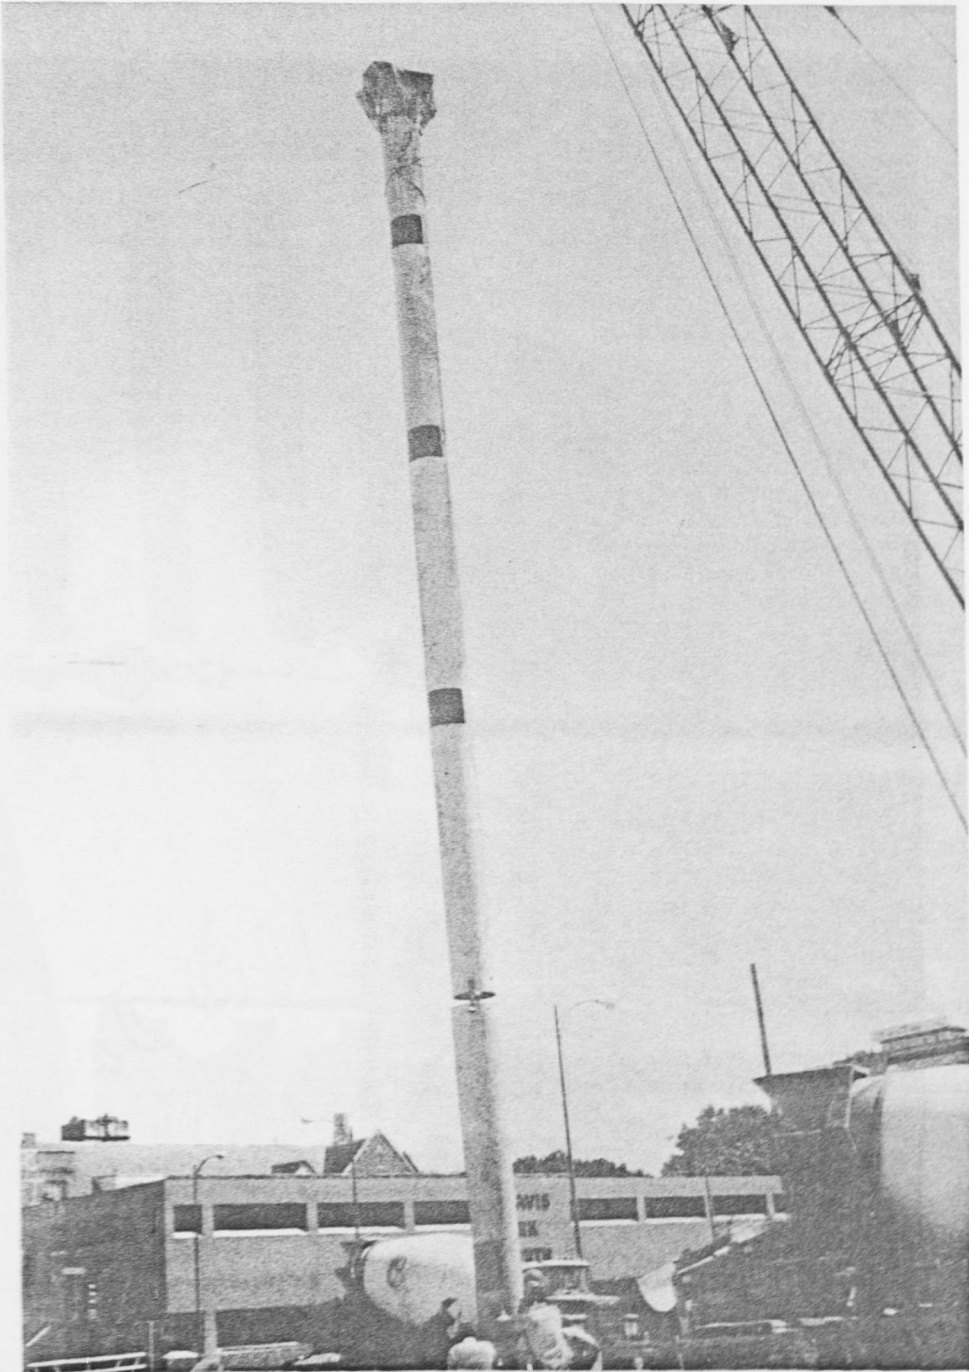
TREMIE BEING LOWERED INSIDE INSTRUMENTED CAGE
